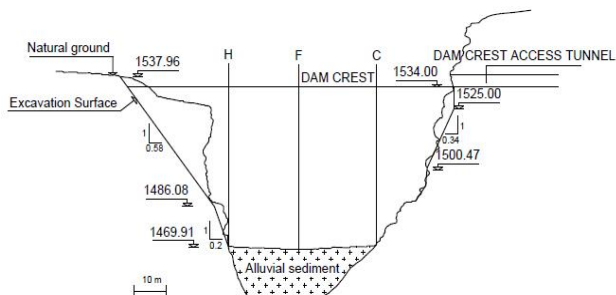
The longitudinal section of the dam and the instrumentation sections (upstream face)
